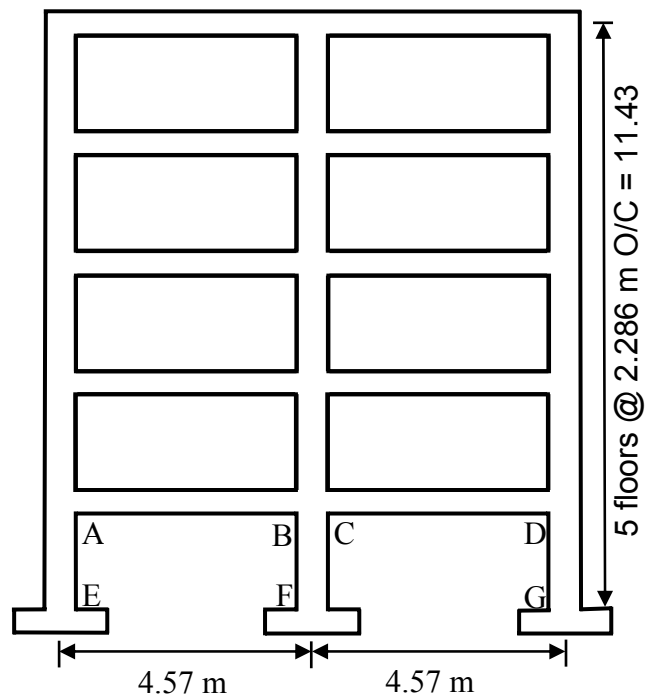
(b). Elevation view of the scaled hybrid frame building
